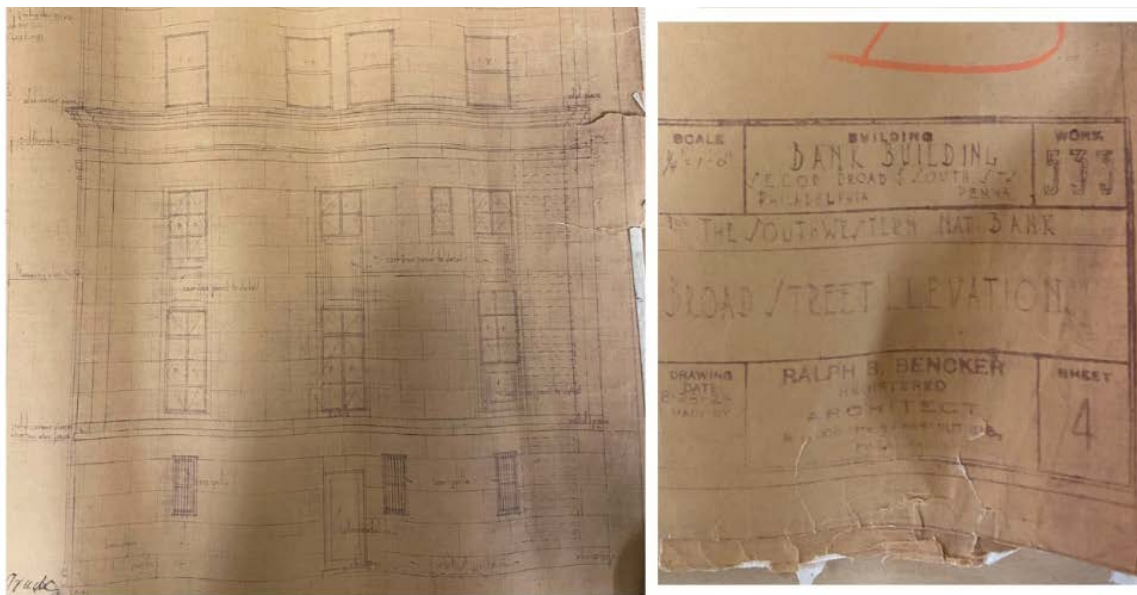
Photographs taken at Philadelphia City Archive of the set of building plans known as Building Plan No. 1581, filed 9/18/1928 alongside Building Permit No. 6903.
